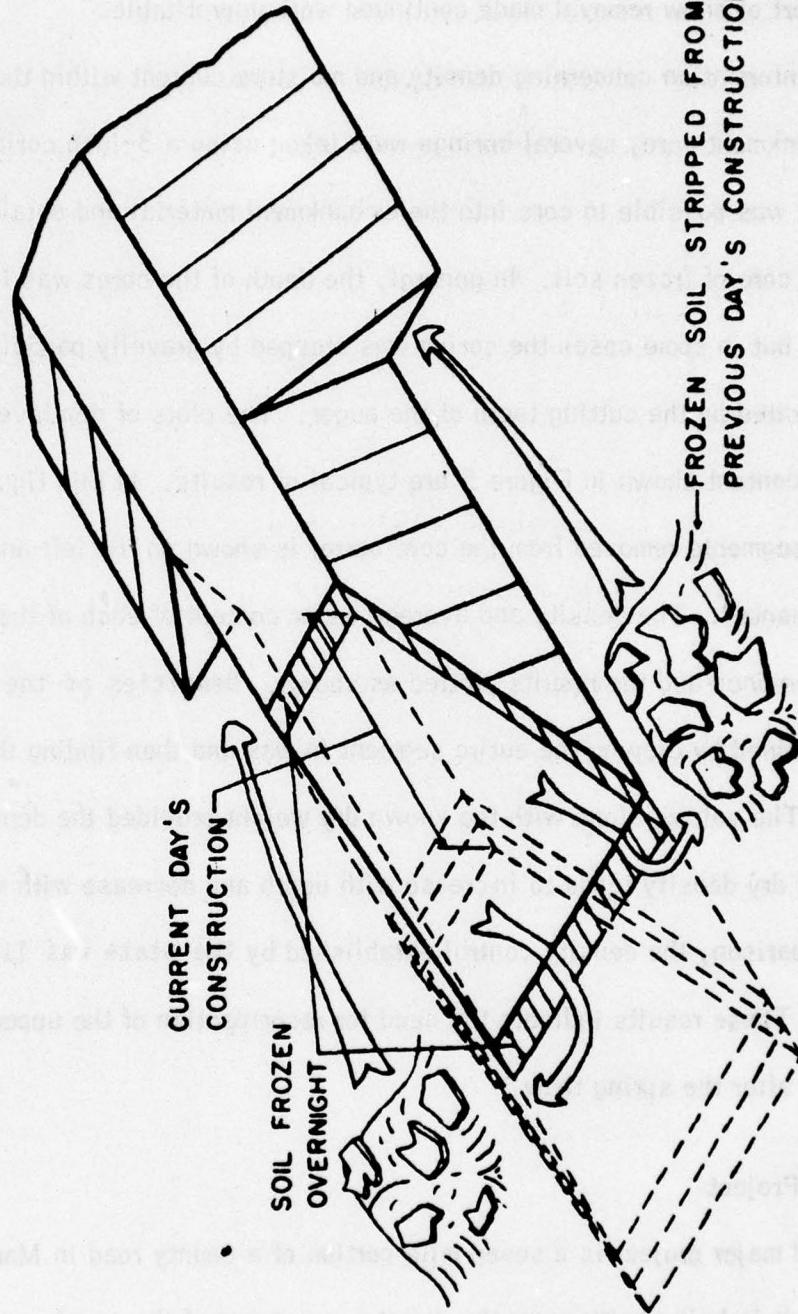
Constructing an Embankment by the Ramp Method to Prevent Freezing of Fill Before Compaction is Complete
